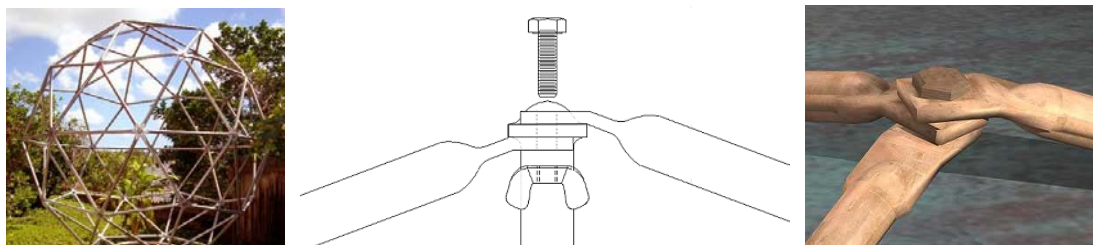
Use wing nuts for quick assembly/disassembly in flattened conduit. (Source: [14])
